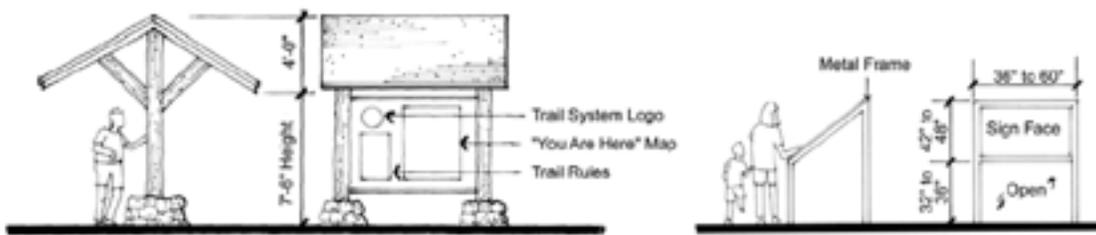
Trailhead information installations provide gateways between on-street facilities and greenway systems.
